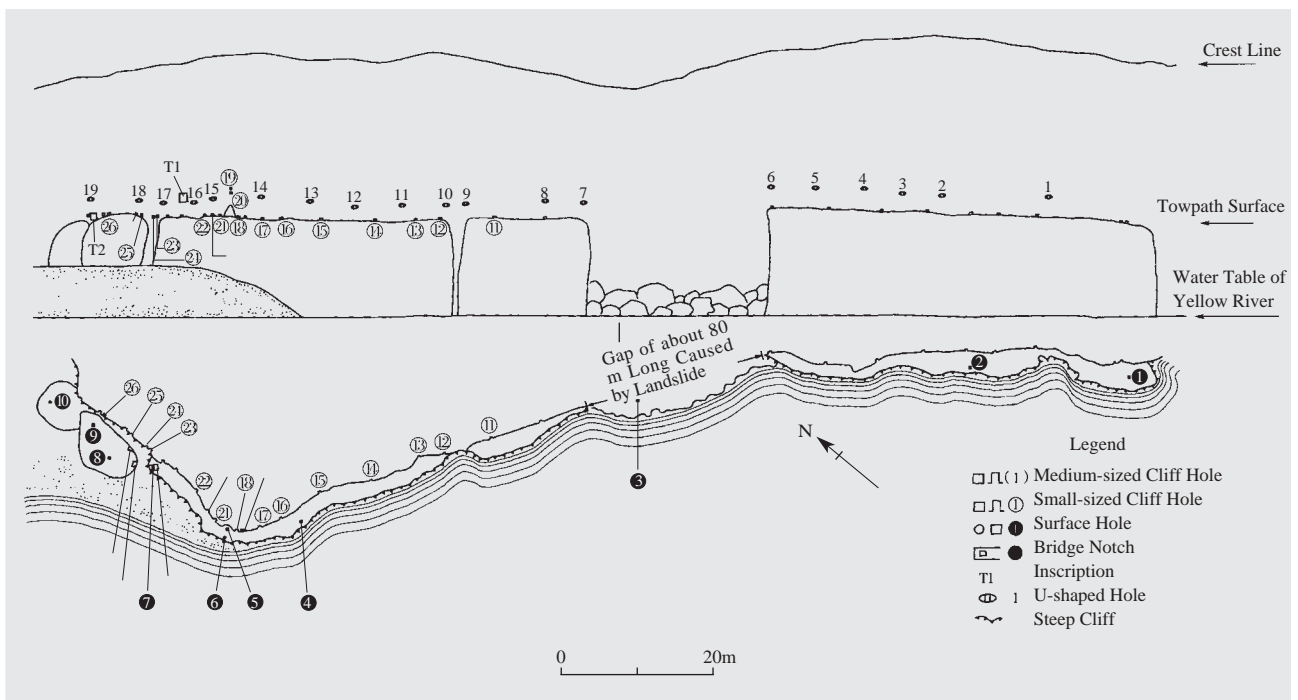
The Elevation and Plan of Towpath Remains of Section Three
